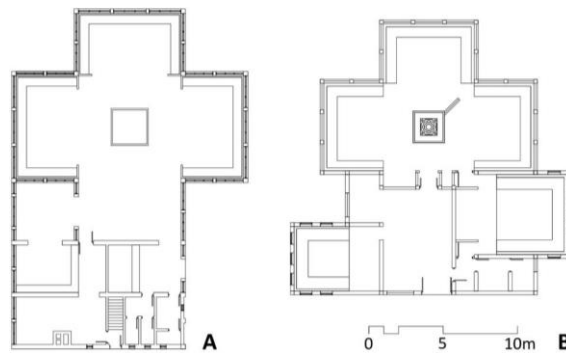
a: Floor plan of Taşlık Coffeehouse b: Floor plan of the Seaside Mansion of Amcazade Hüseyin Paşa
